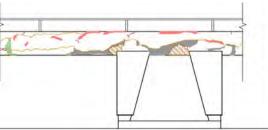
Bridge west elevation condition mapping (Source: created by authors)
